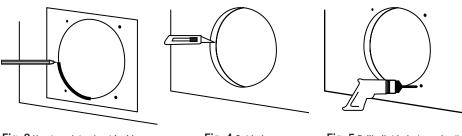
Use template sheet inside carton to trace onto mounting location hole
